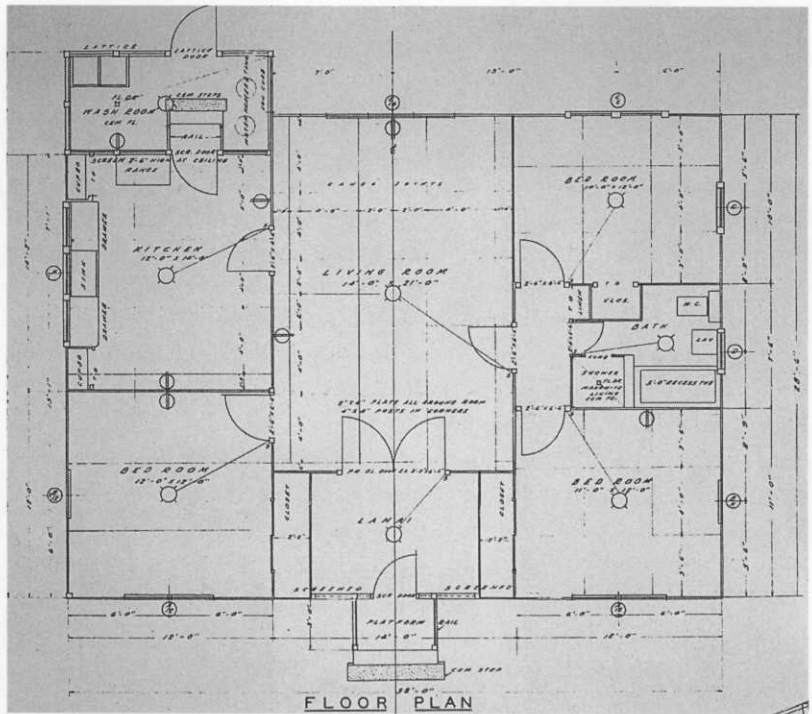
Floor plan of the Tenney Village single-family house, 1936. (Grove Farm Homestead)
